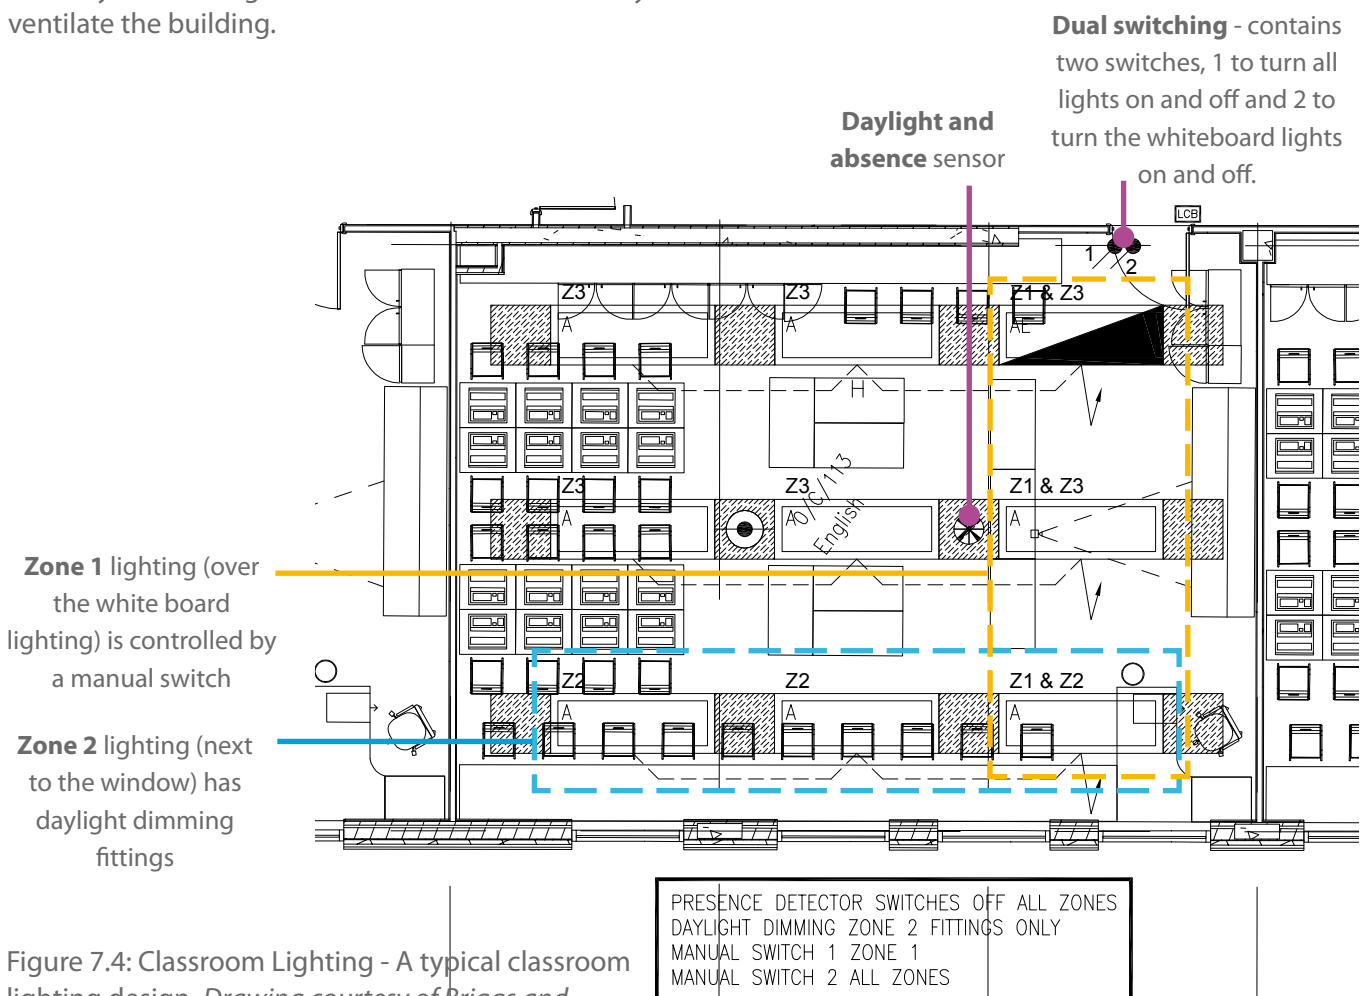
Classroom Lighting - A typical classroom lighting design. *Drawing courtesy of Briggs and Forrester
